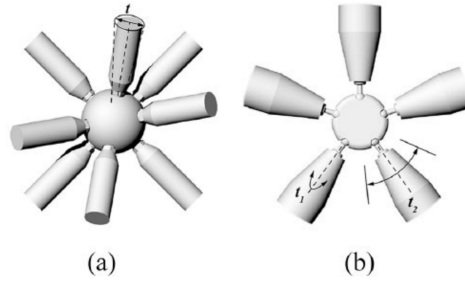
Spherical ball joints and ball socket joints used in space frame construction [63]
